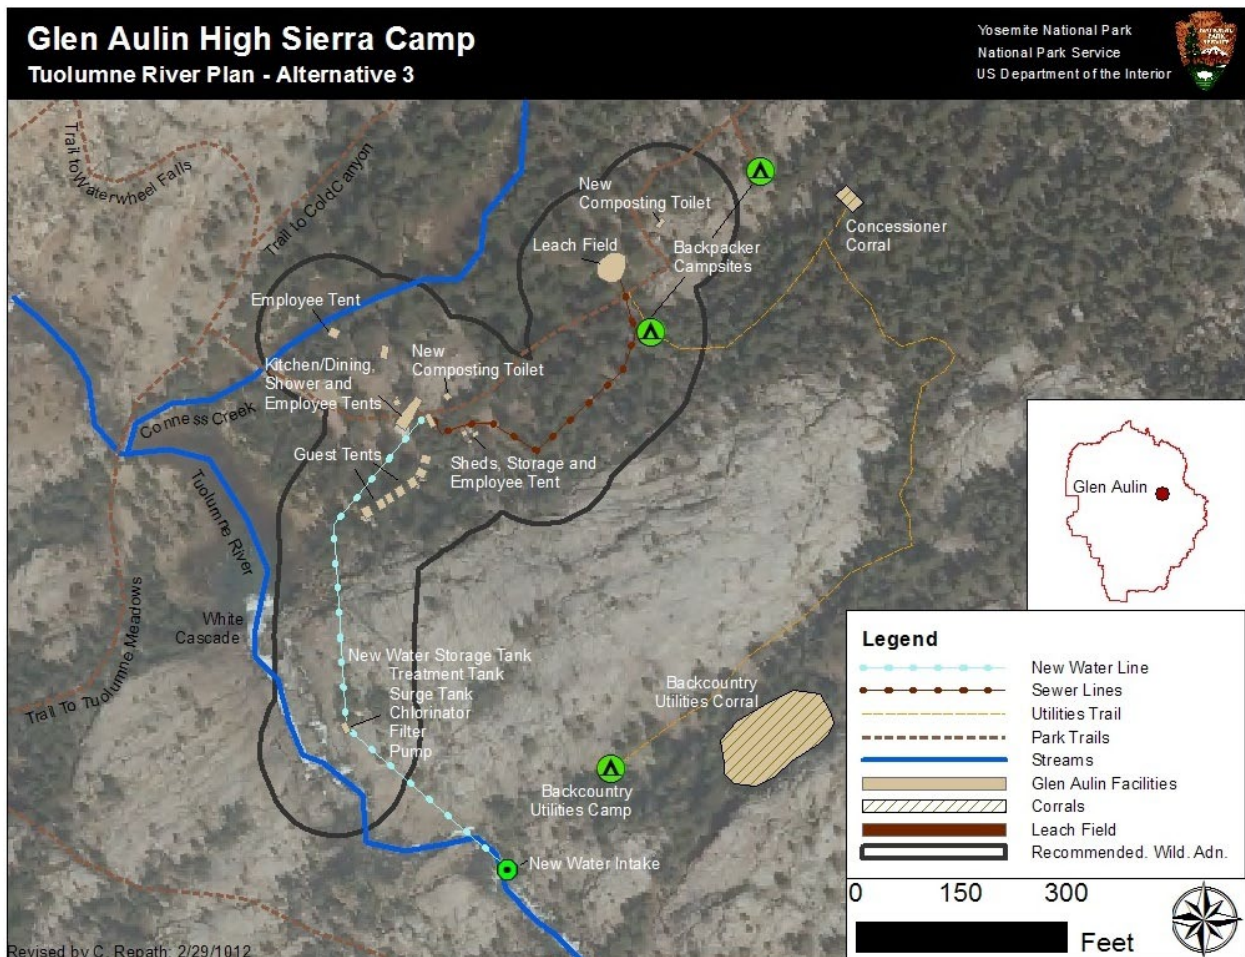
Glen Aulin Site Plan, Alternative 3.
